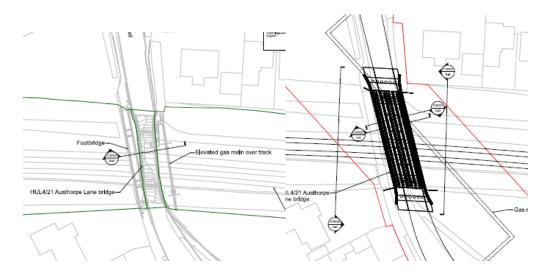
Existing and proposed Austhorpe Lane Bridge layout
